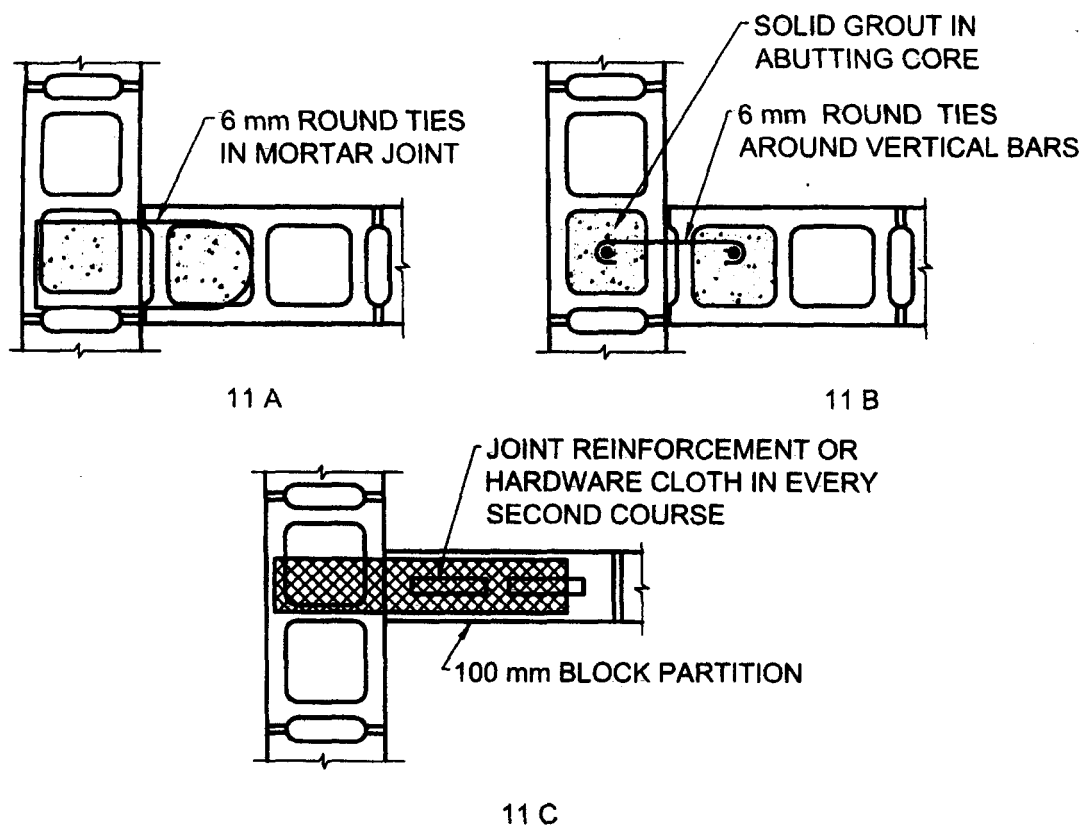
RIGID CONNECTIONS FOR INTERSECTING WALLS
